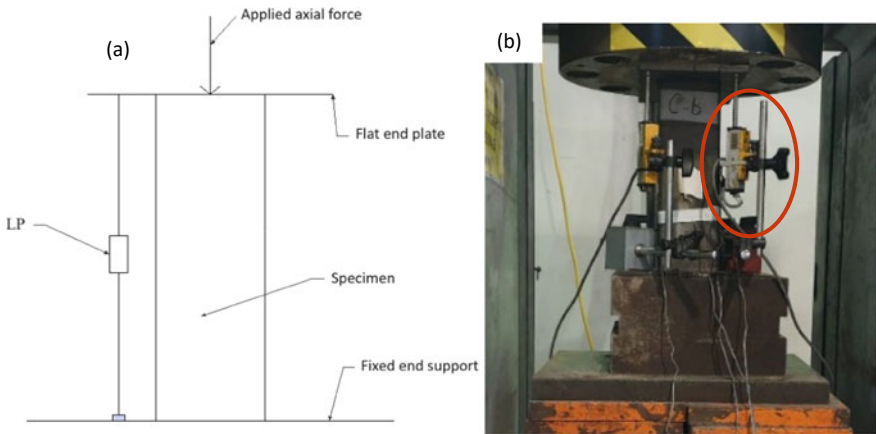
Test setup: a Schematic diagram and b test setup in compression-testing machine showing LP1516
